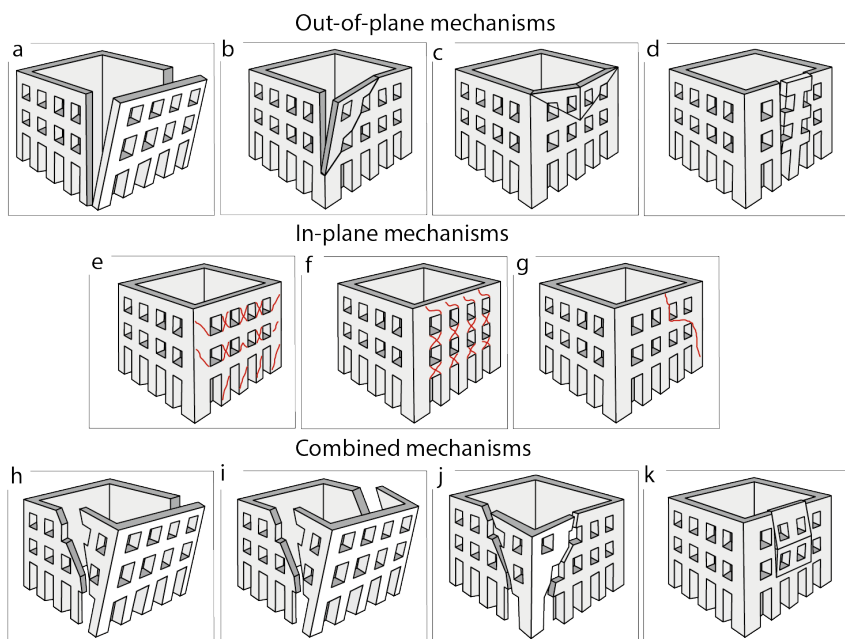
List of failure modes at building scale. a) Vertical overturning. b) Partial overturning. c) Horizontal arch. d) Vertical strip overturning. e) Cracks in piers. f) Cracks in spandrels g). Transverse cracks. h) Overturning with one side wing. i) Overturning with two side wings. j) Corner failure. k) Vertical arch. From [15]
